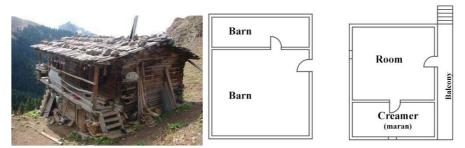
Cancir Highland Dwellings (Orhan, 2015), ground floor and first floor plan (drawn by the author)
